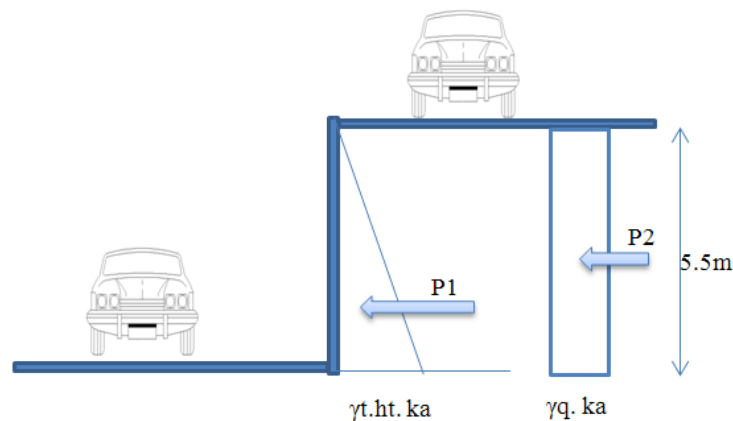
Soil Pressure on Pile Walls for Bore Pile Reinforcement.
